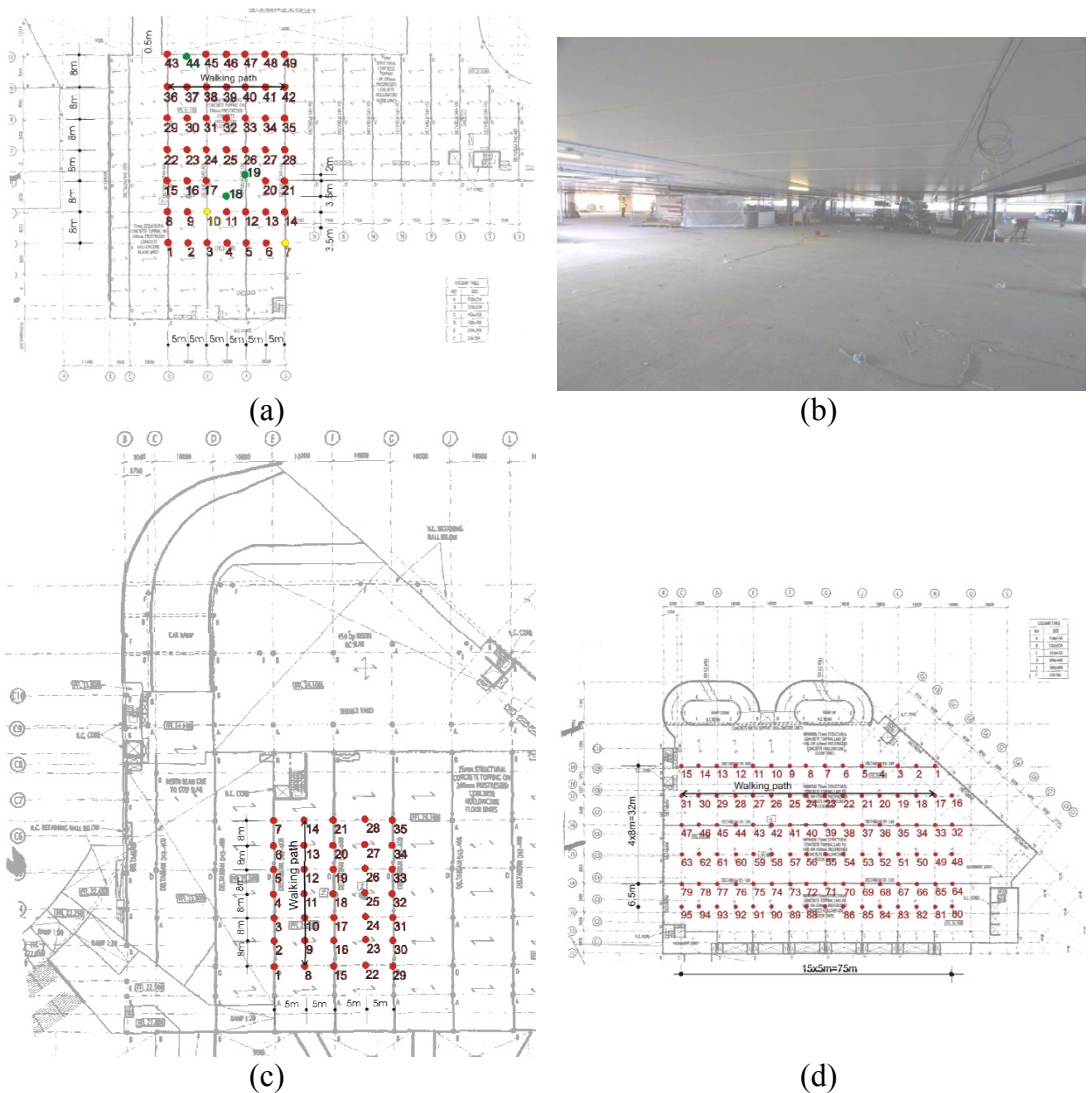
(a) Plan of Level 1 Car Park (b) Level 1 Car Park floor during testing (c) Plan of Retail Area (d) Plan of Level 2 Car Park
